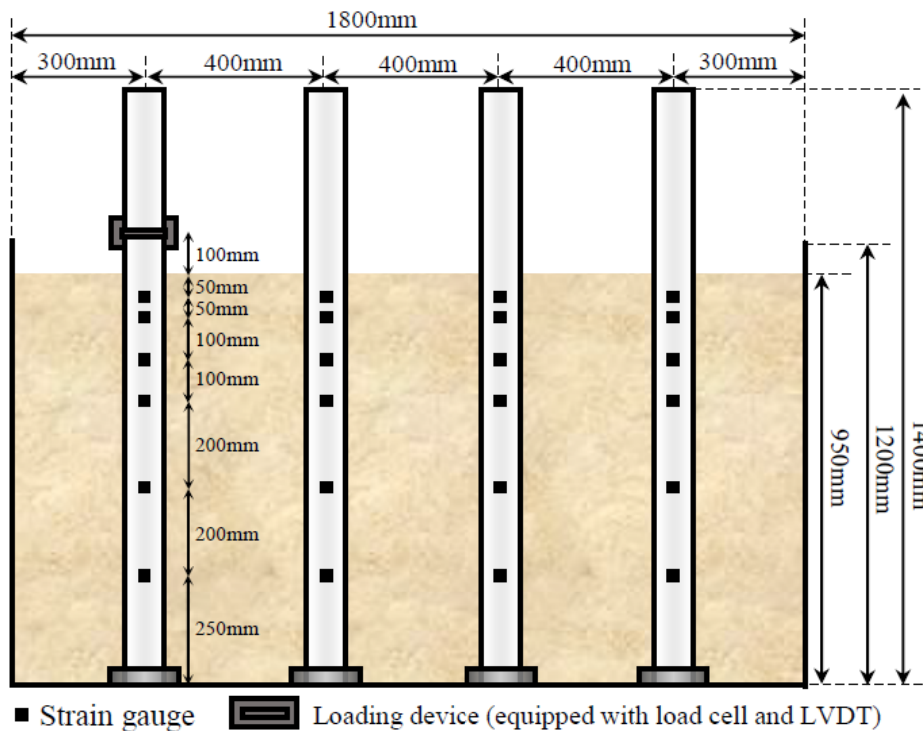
Schematic drawing of the model pile test (cross-sectional view)
